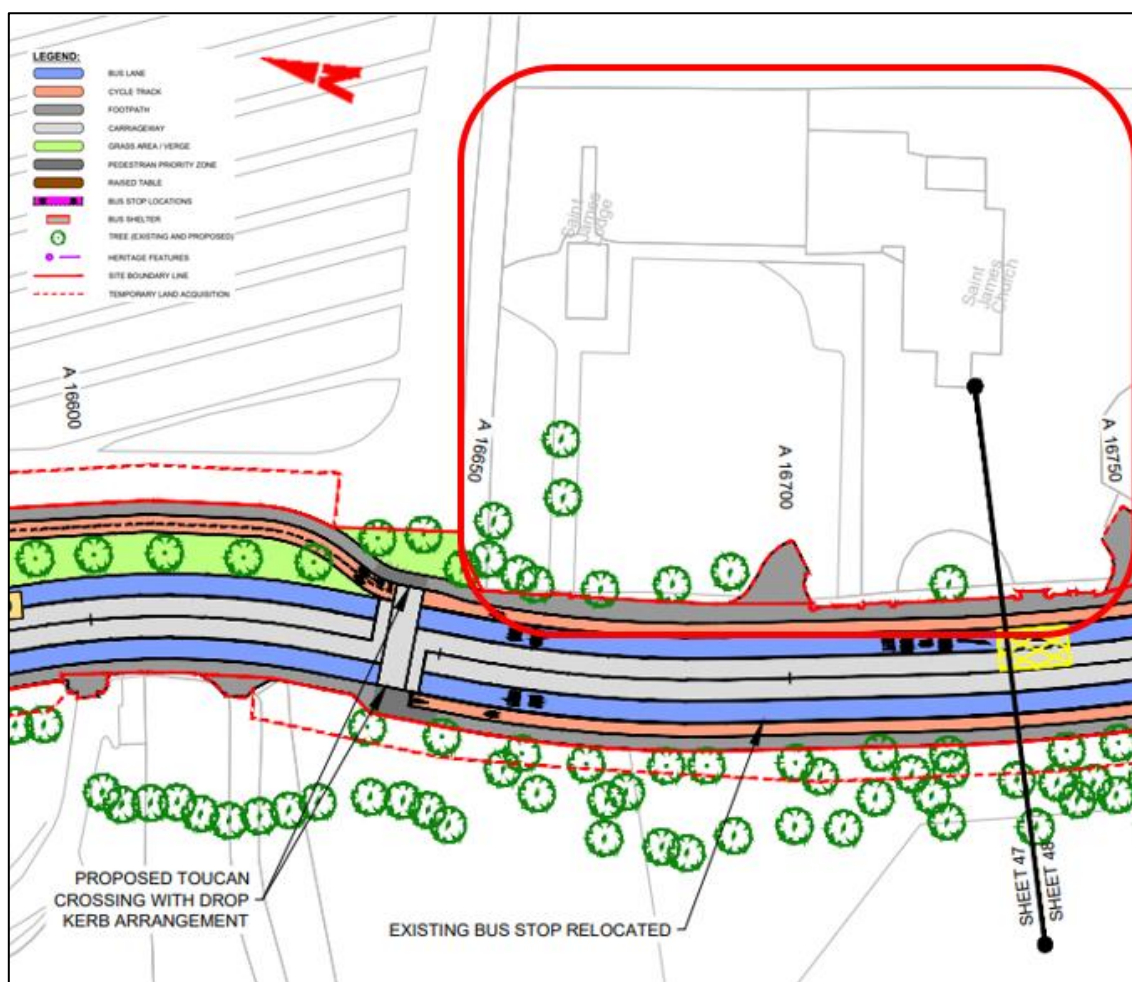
Extract from General Arrangement Drawing at Dublin Road (Sheet 47)
